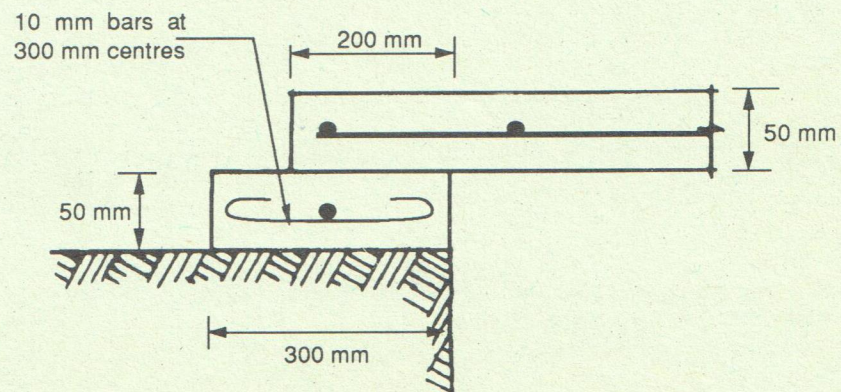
A DETAILS OF SQUAT TYPE COVER SLAB
